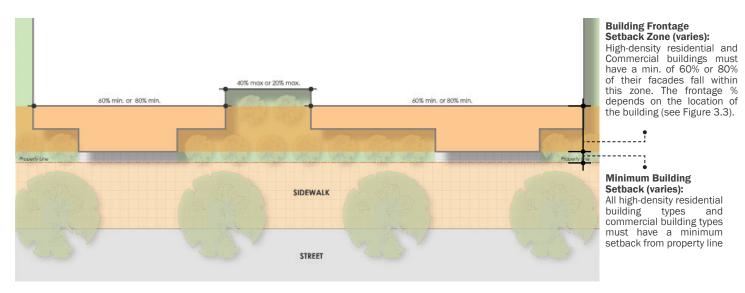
BUILDING SETBACKS AND DETAILED FRONTAGE
